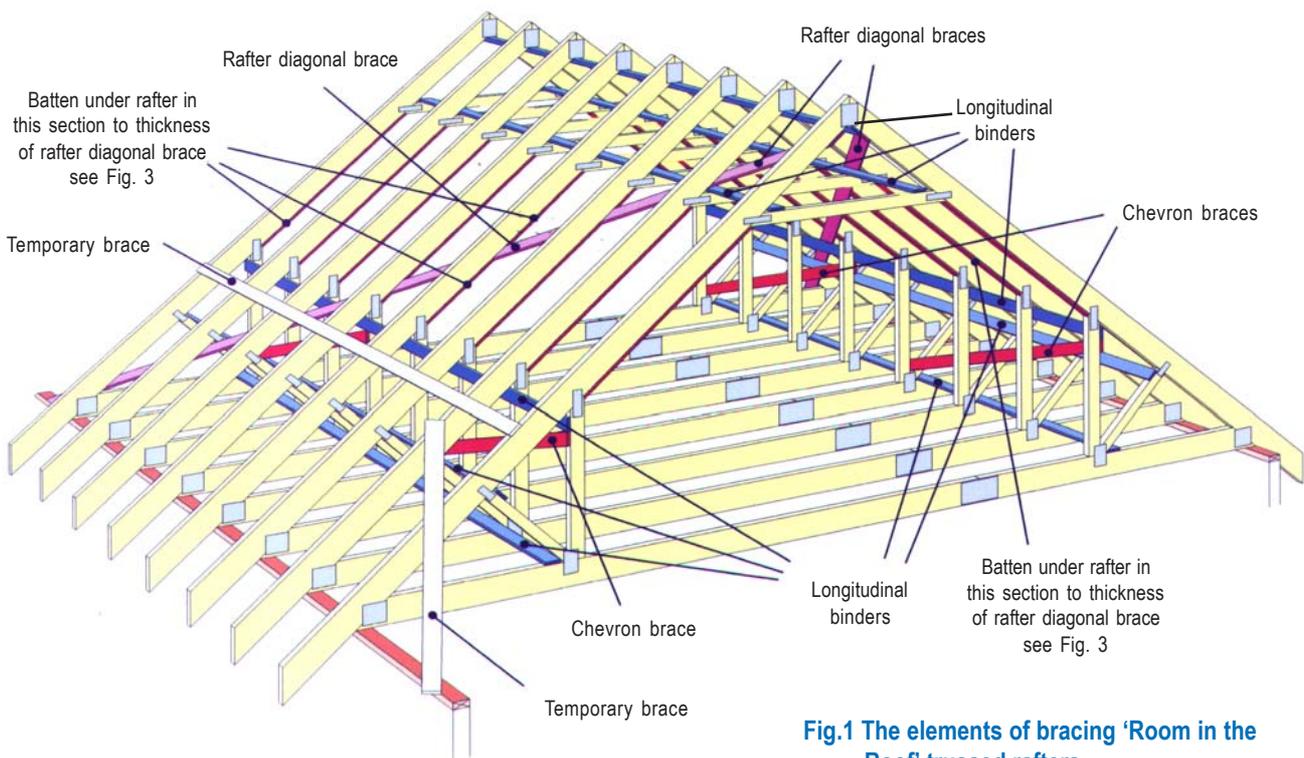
The elements of bracing 'Room in the Roof' trussed rafters
